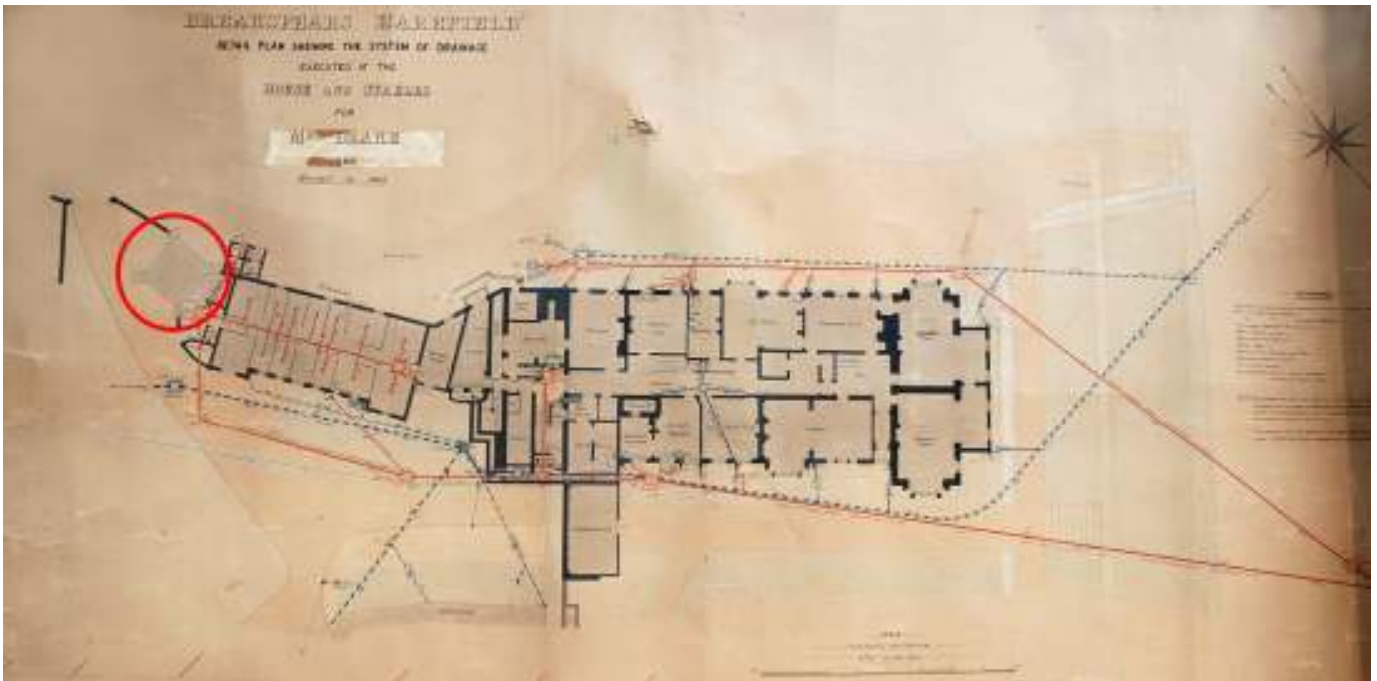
Architect's floor plan and drainage of Breakspears, by Roger Field, 1894, with the dovecote circled in red
